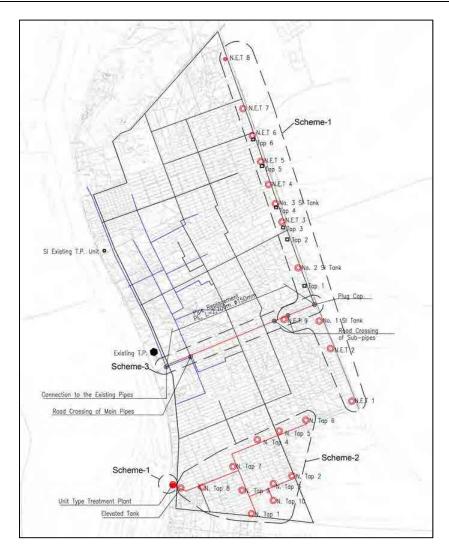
Plan Layout for Small-Scale Water Supply System
